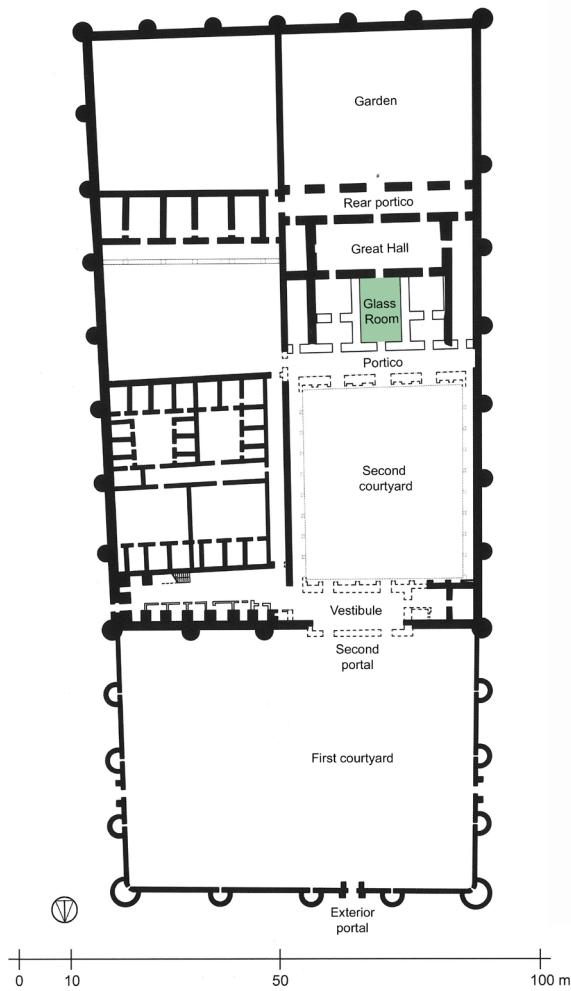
(left). Raqqa, Palace B, ground plan and position of the “Glass Room” (Room 9 in excavation plan) in spatial sequence of official wing. (Drawing: after Siegel [note 5], fig. 7; amended and labeled by the author, 2020)
